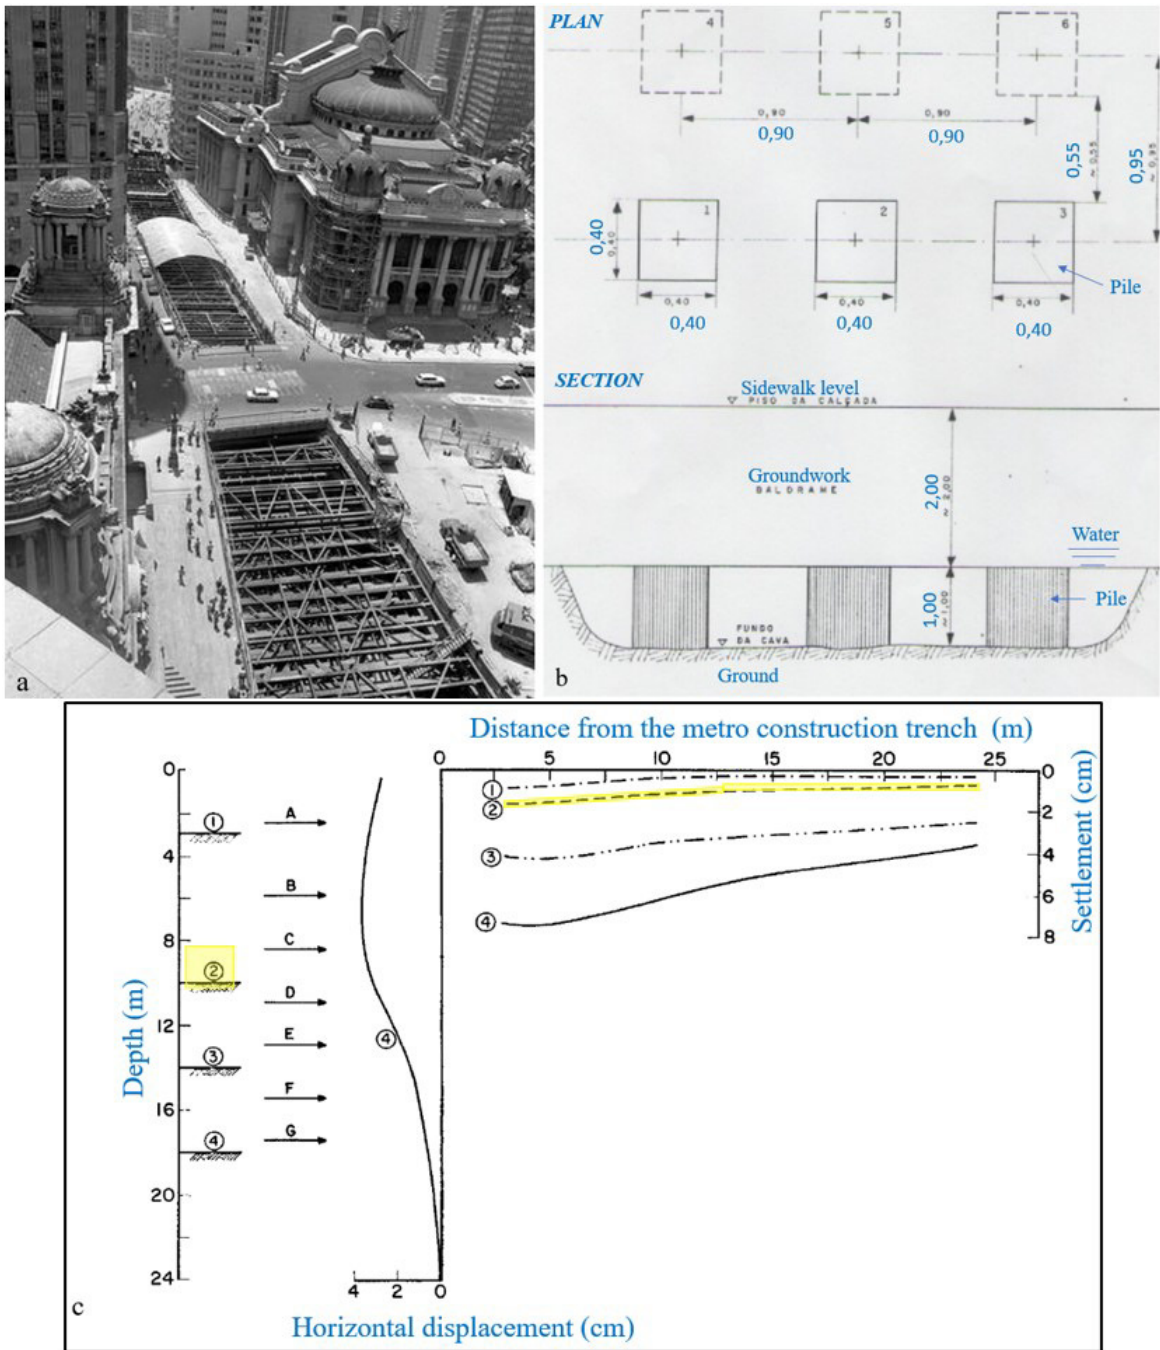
Construction of the subway in the 1970s: (a) overview of the trench next to TMRJ; (b) plan view and section of wooden piles in the foundations; (c) displacements measured in the subway construction trench at Largo da Carioca. Source: a) Photo – Paulo Moreira, 21/05/1975, <https://acervo.oglobo.globo.com>, access 07/12/2022 [52]; b, c) adapted from report [7], [53].
